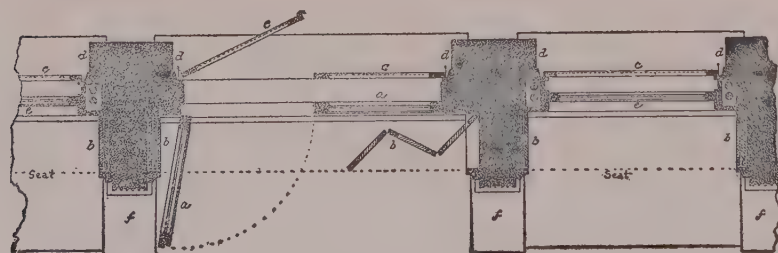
Plan of a three-opening mullioned window in a brick or stone wall in which the central opening is a French window
